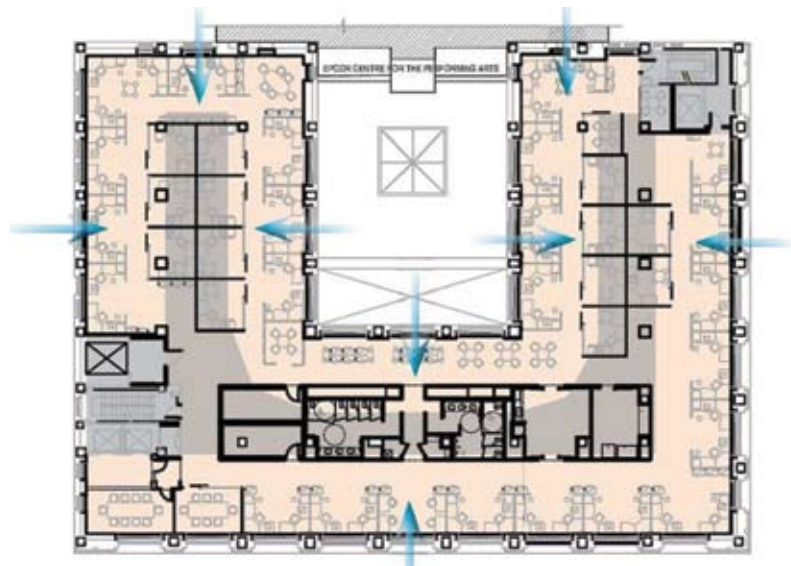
Floor plan illustrating zones with access to natural light and natural ventilation, which dictated the new interior office arrangement. Uses not requiring natural light including washrooms and storage are more centrally located, allowing better exterior access for office spaces. Calgary Public Building, Calgary, AB. Source: SAB Magazine.
